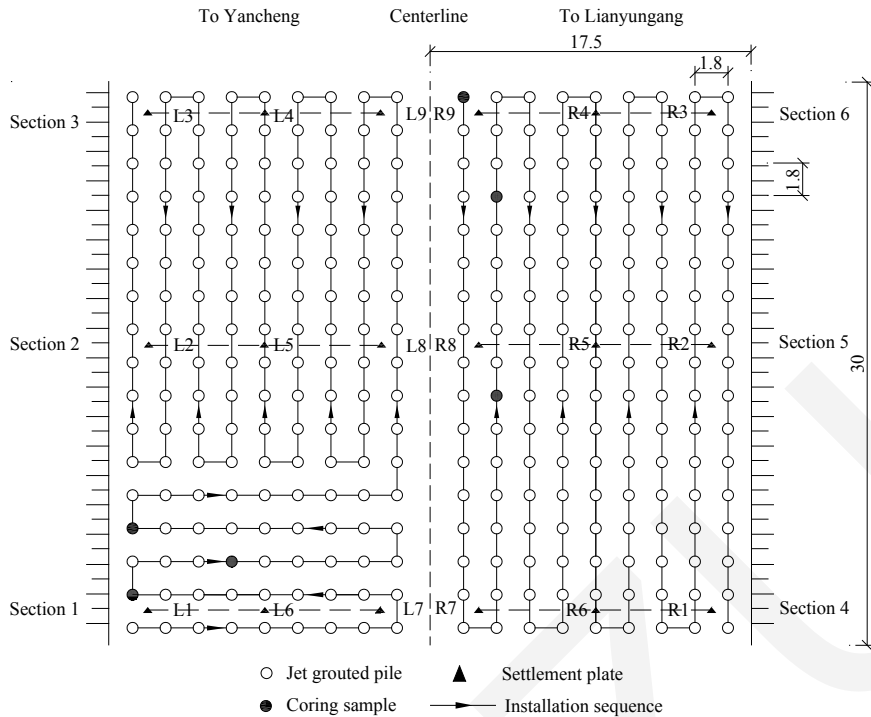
Plan view of the experimental site on the Lianyan highway (unit: m)
